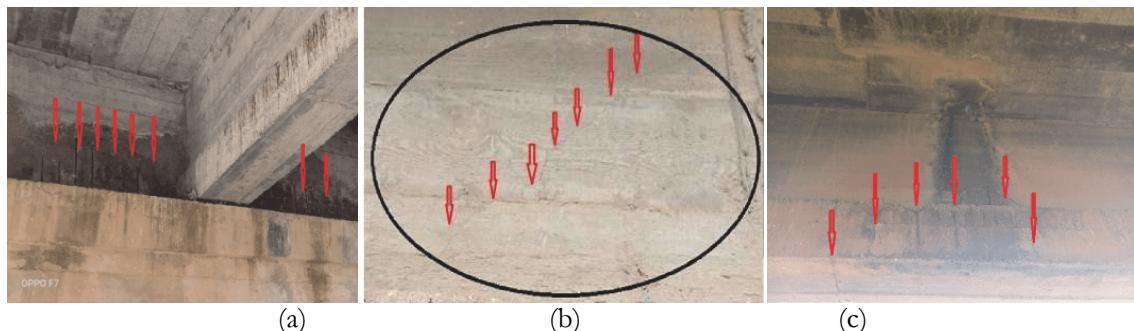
Degradation on the lower part of the bridge. (a) Degradation on spacer 4, (b) Degradation on beam 1, (c) Degradation on beam 3.
